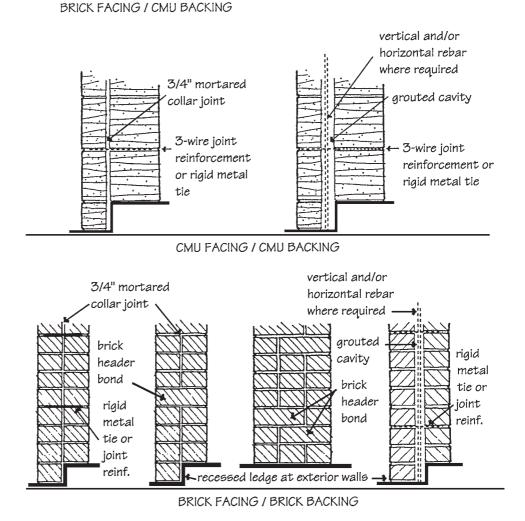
Composite masonry walls. (From Beall and Jaffe, Concrete and Masonry Databook, McGraw-Hill, New York, 2003.)
